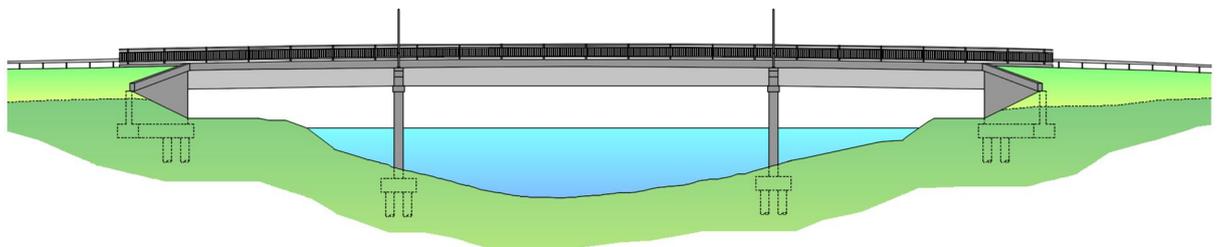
Indicative Cross Section for Wright Street Bridge
